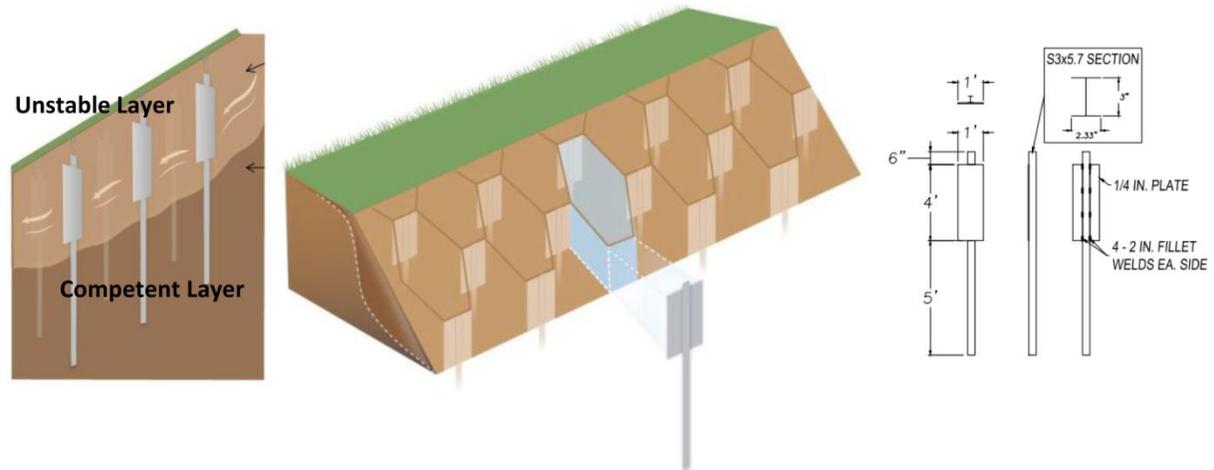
Repair Concept and Pile Dimensions (Geopier SRT)
